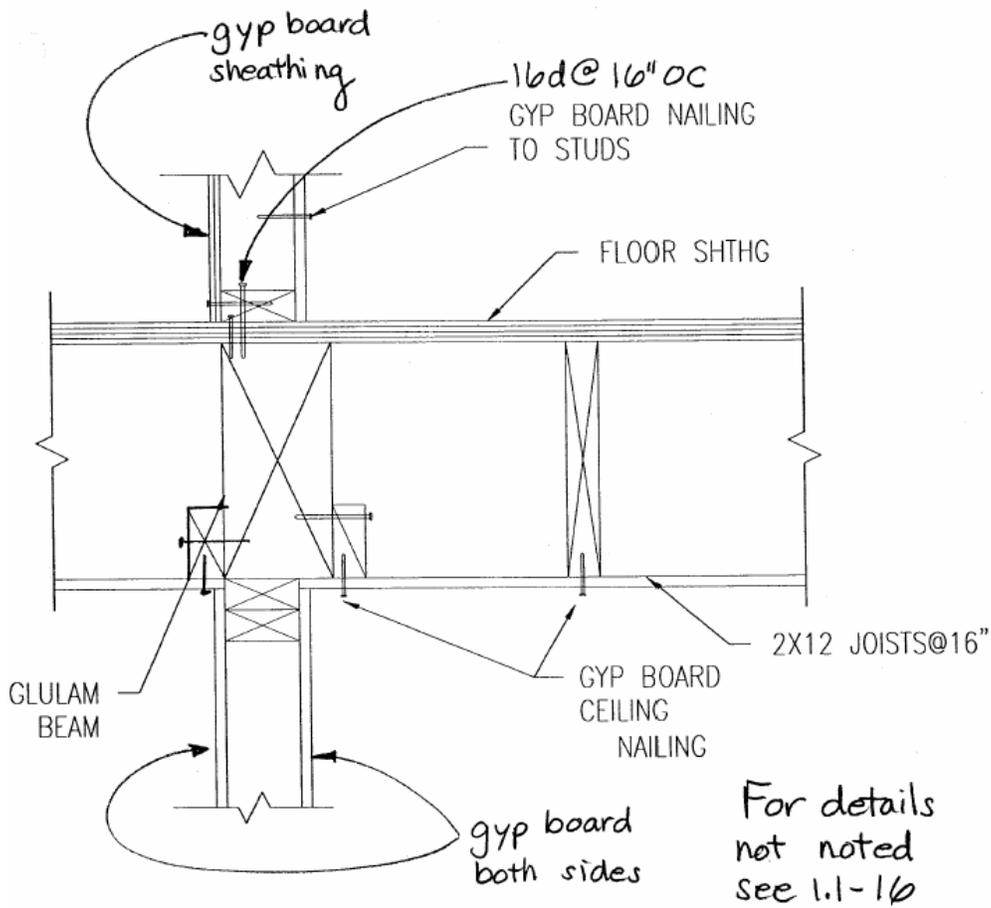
Index building 4 floor at line-4 glulam (detail 6-S2)
